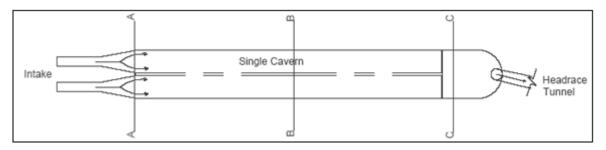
Plan Layout of settling basin cavern for alternative II with distinct sections
